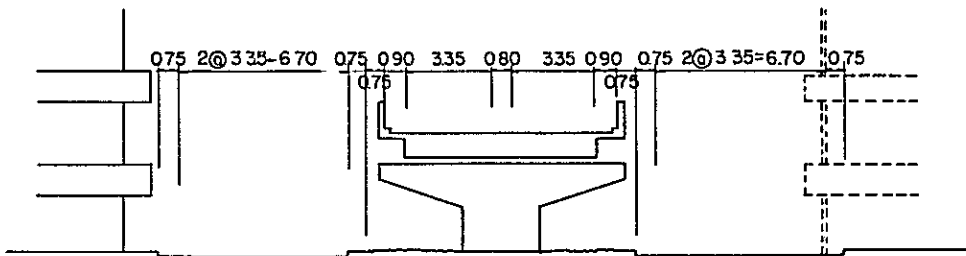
ALTERNATIVE CROSS SECTION FOR VIA BRASIL FLYOVER
